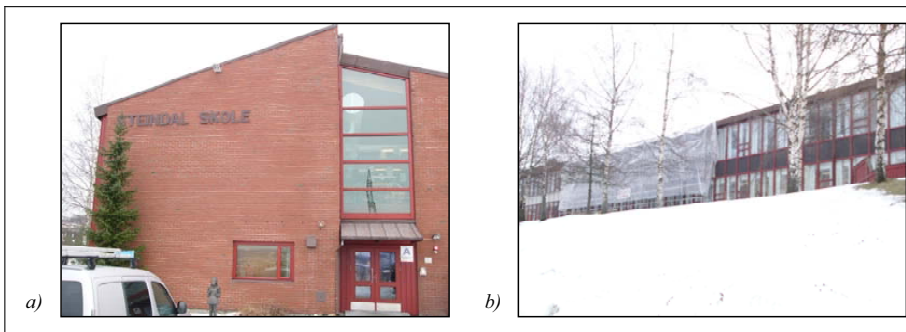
Steindal school a) west façade, and b) north glazed façade.
